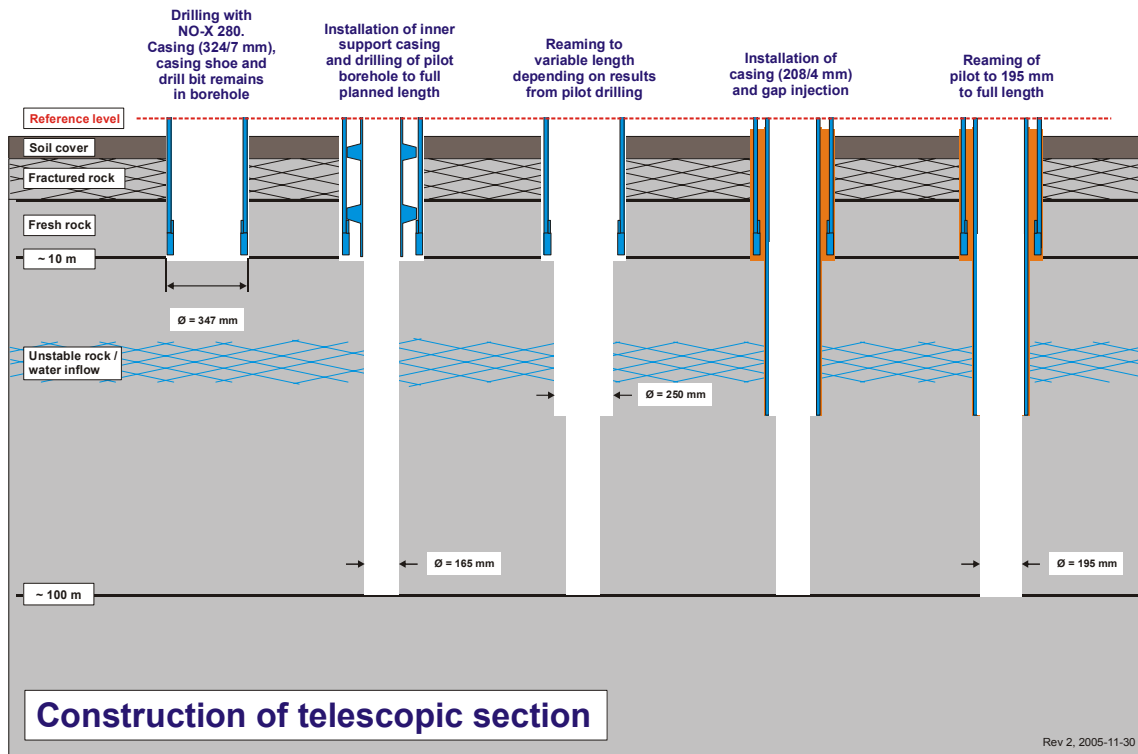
Construction of the telescopic section. The grouting cement is introduced between the casing and the rock wall. The drill bit acts as a barrier so that cement does not enter the pilot hole.
